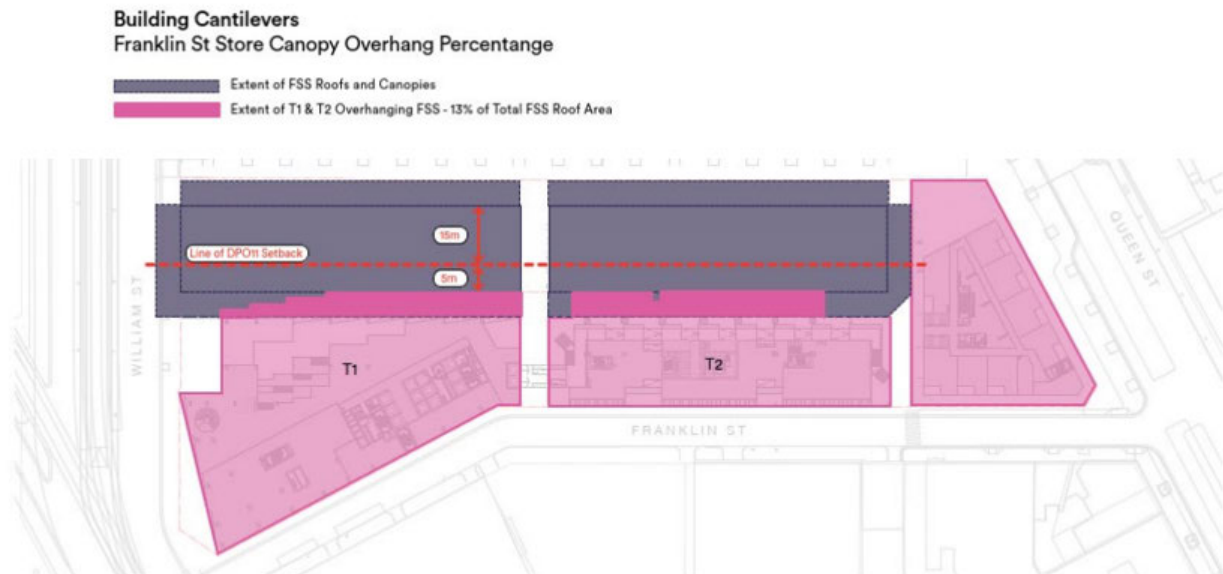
Extent of cantilever over the Franklin Street Stores. The horizontal red dotted line indicates the extent of cantilever allowable under DPO11. The proposed extent of cantilever (shaded dark red) is substantially less. (Source: Lendlease (undated) Queen Victoria Market – Southern Development Site Project Feasibility – Tower 1 and Tower 2)
